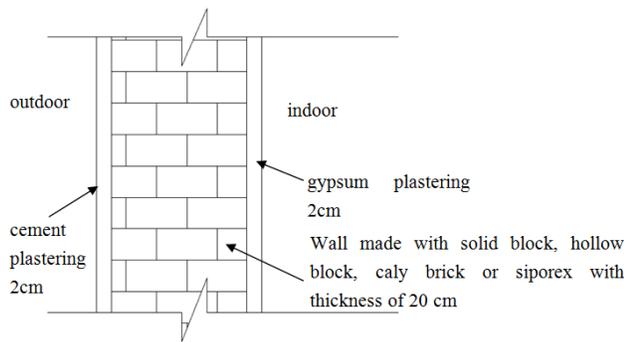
Section of the widely used wall of the buildings in Duhok City
